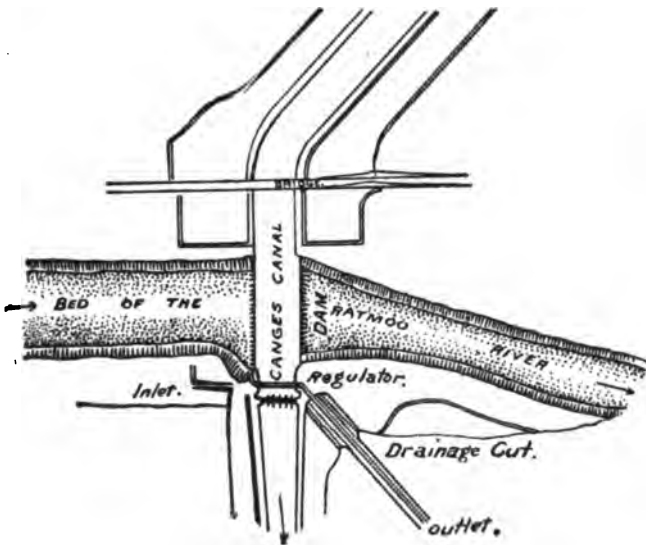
Plan of Rutmoo Crossing, Ganges Canal, India.
